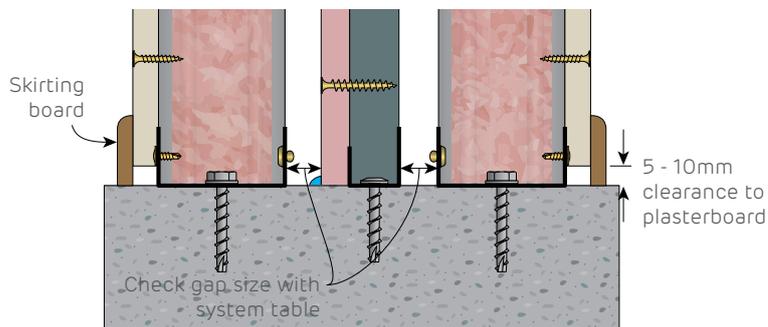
Alternative Wall Base J-track below Shaftliner
